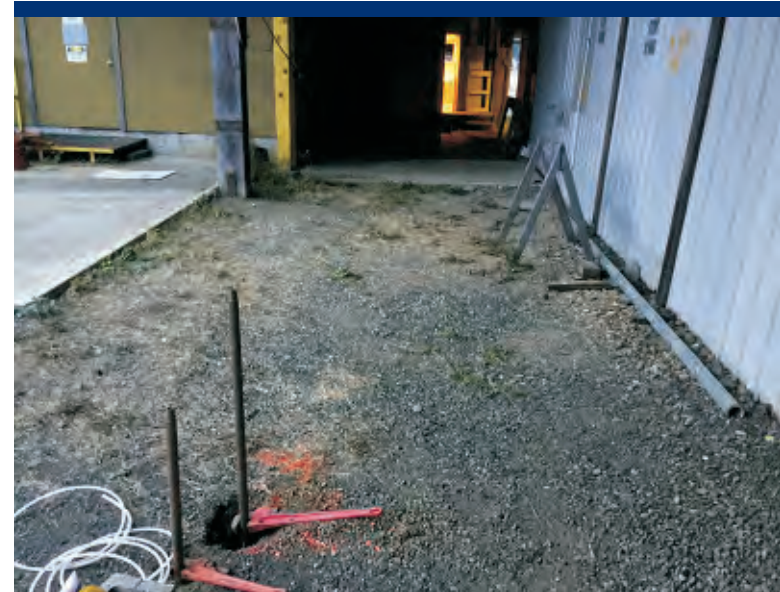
Location PB04 with two boring locations visible. Multiple attempts needed to get sufficient soil and water.
